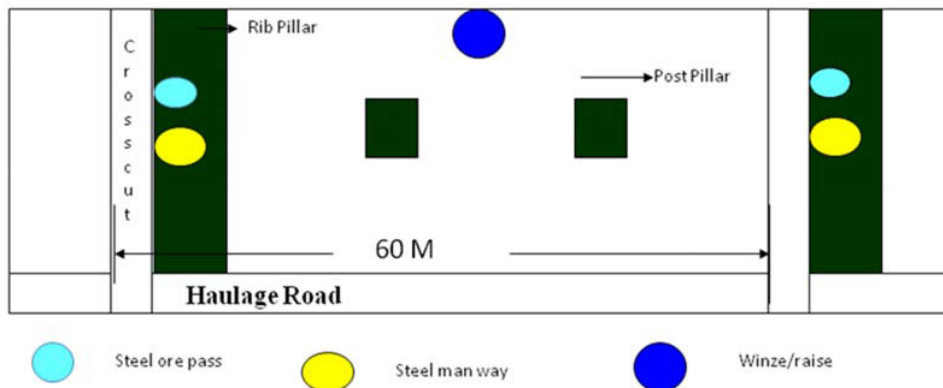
Conceptual Plan of 60m Stope at Balaghat Mine
